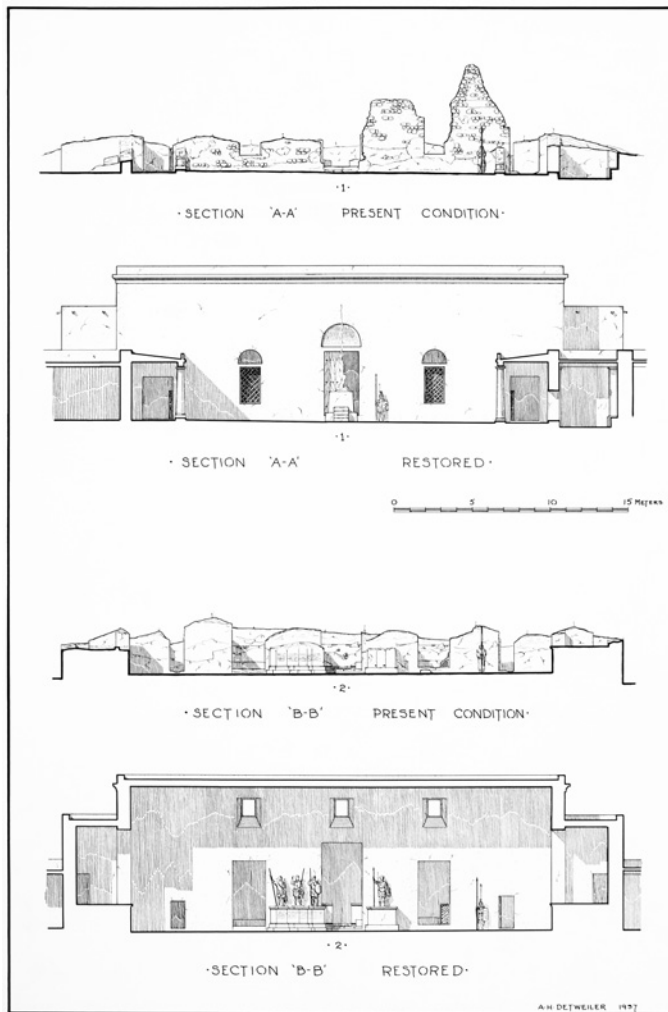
Principia* E-W elevation drawings by Detweiler.
